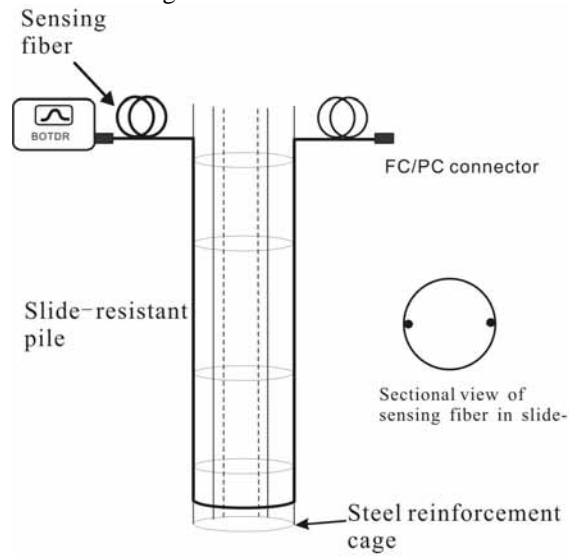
The layout and installation of sensing fiber in a slide-resistant pile
